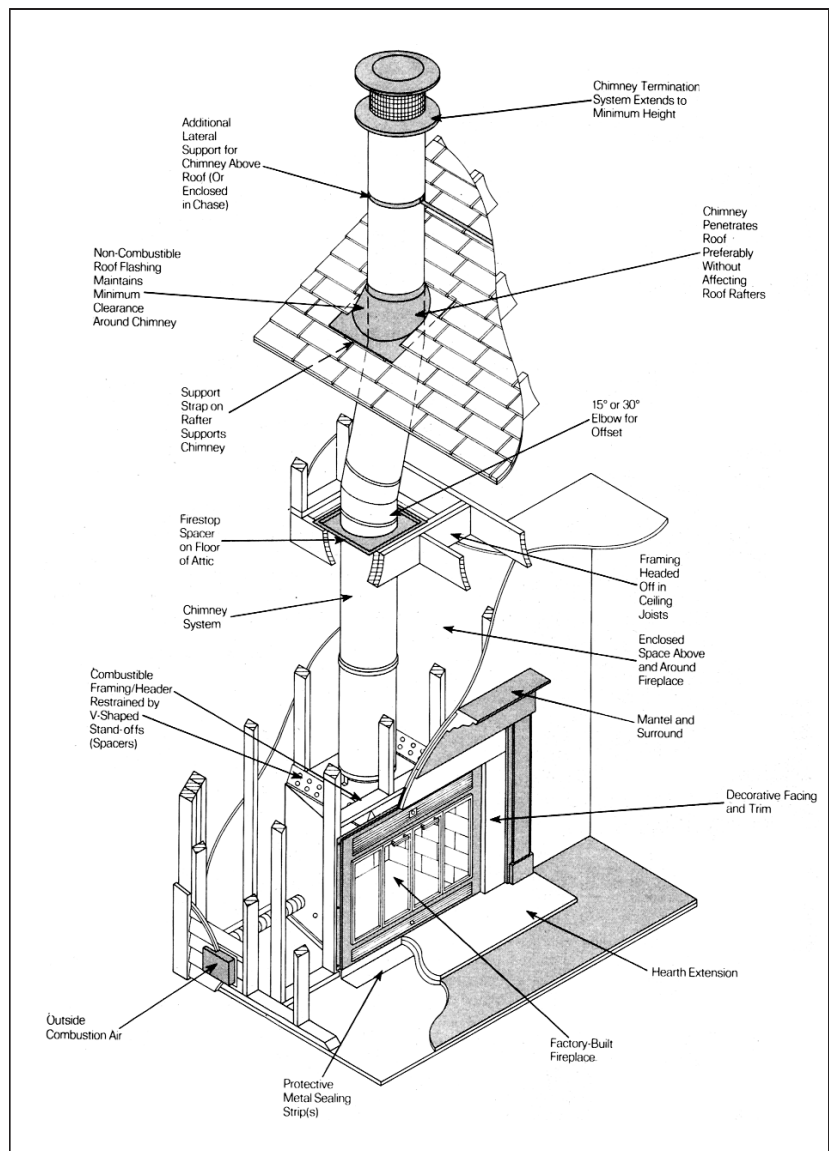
A typical factory-built-fireplace installation "package" consists of a fireplace box, flue system, flashing, and chimney top. All models have individually written instructions that conform to UL standards and must be followed to the letter.
